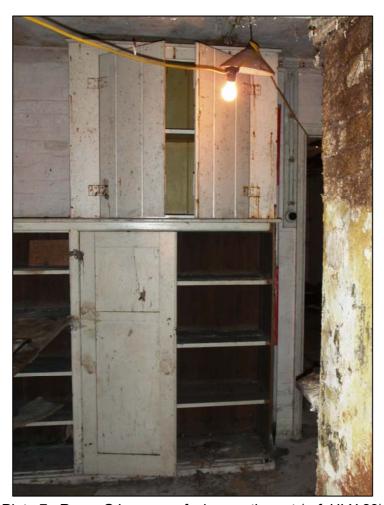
Room G4, camera facing south-east (ref. HLX 23)
